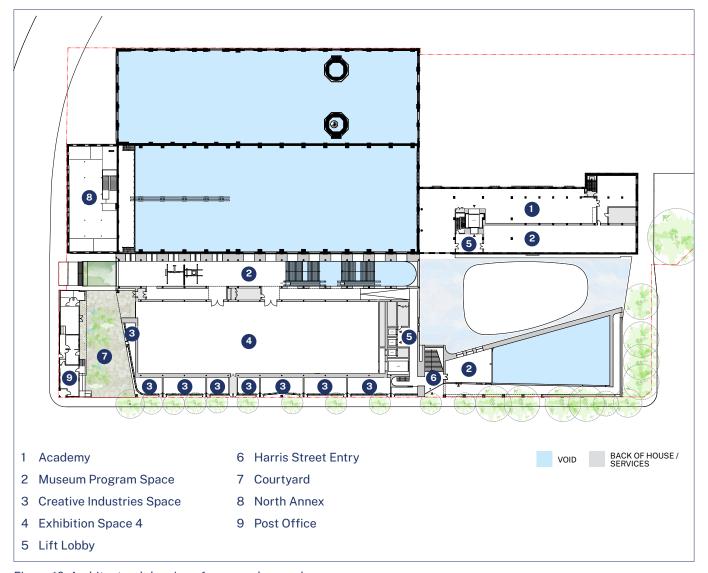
Architectural drawing of proposed second floor of the Powerhouse Museum Ultimo Revitalisation (source: Durbach Block Jaggers and Architectus)
